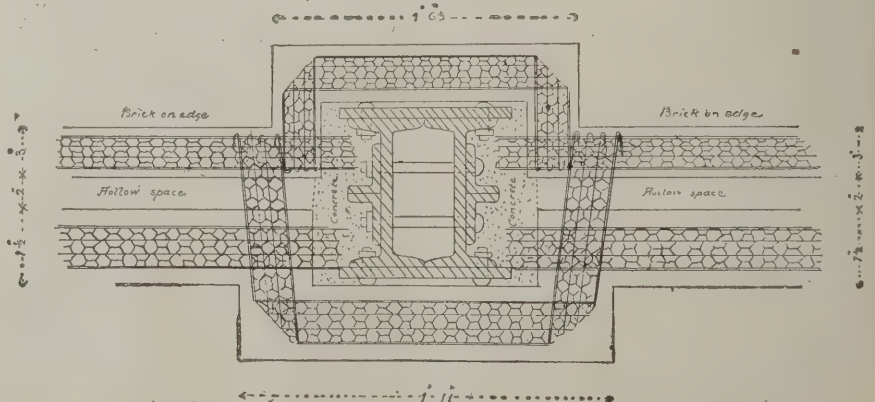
REINFORCED BRICKWORK APPLIED TO STEEL FRAME CONSTRUCTION.
